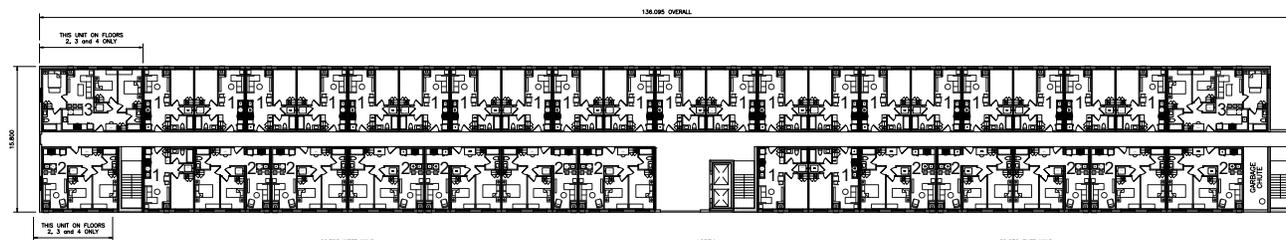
Upper Floor Plan (Typical 2 to 6)
